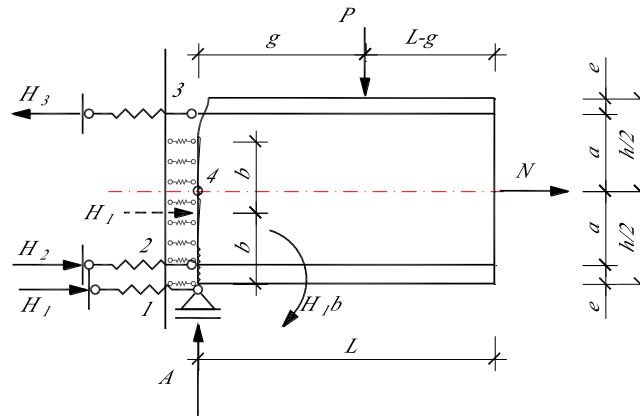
Supports of cantilever beam to column and symmetrical cross section
